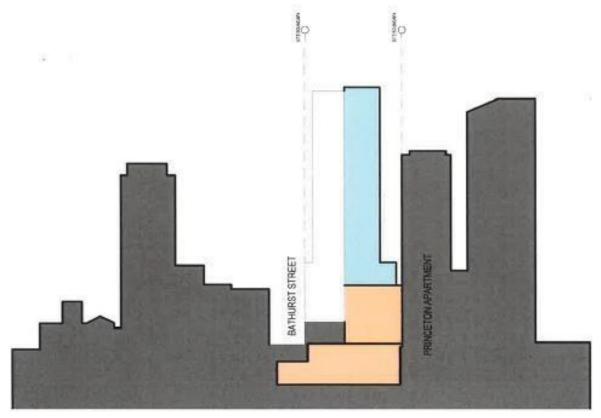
Pitt Street South Concept SSD DA – East West Section
